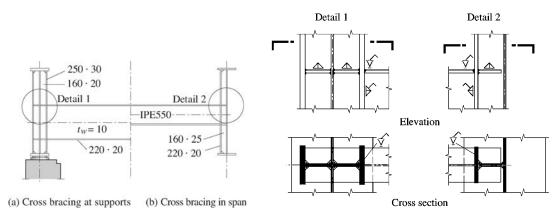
Examples of details for a welded frame cross bracing.
